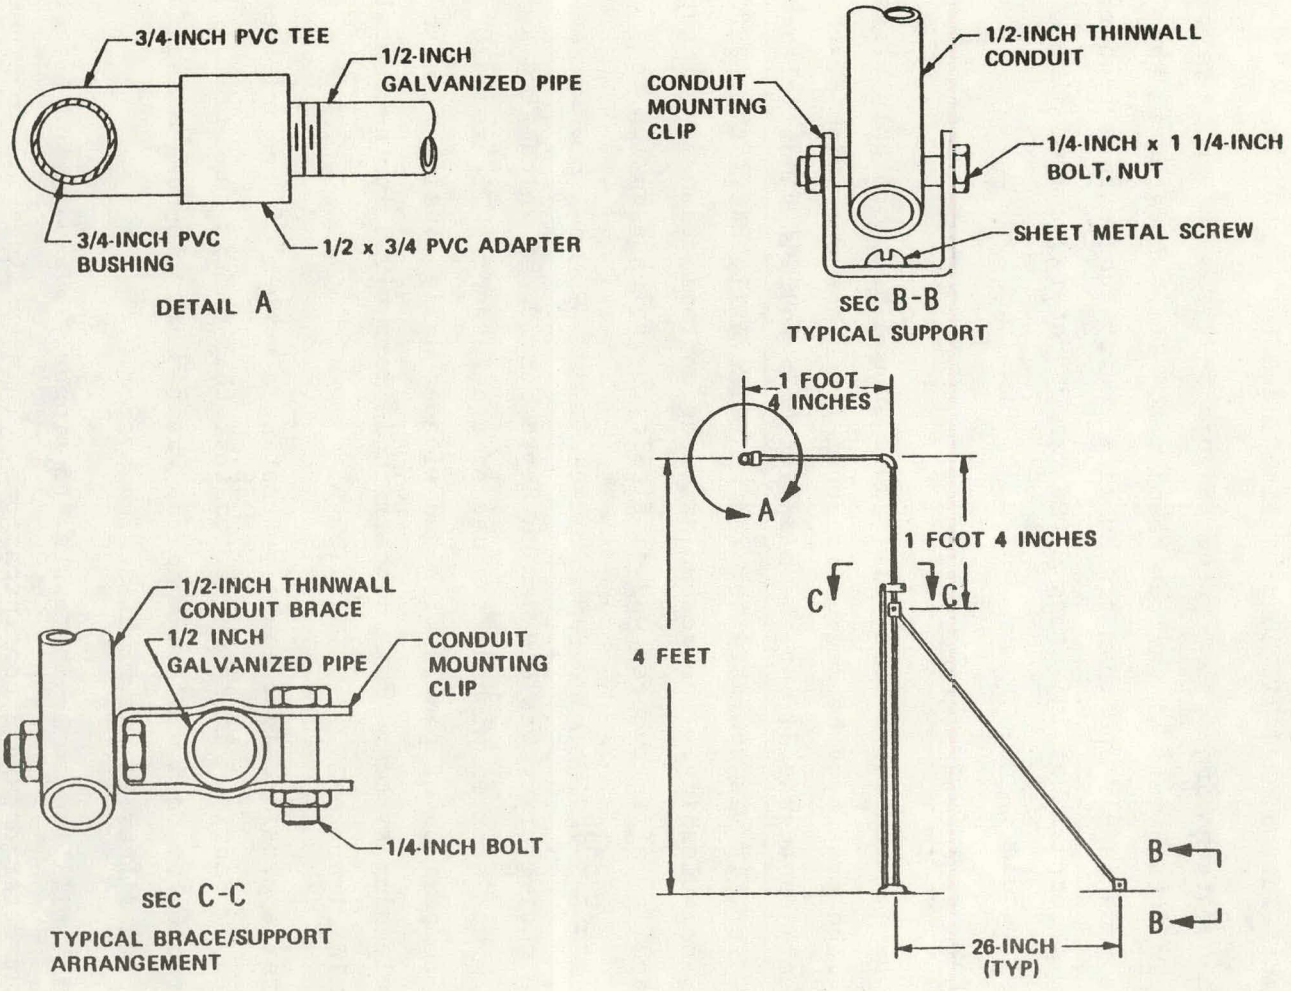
SPRAY TUBE SUPPORT ASSEMBLY
